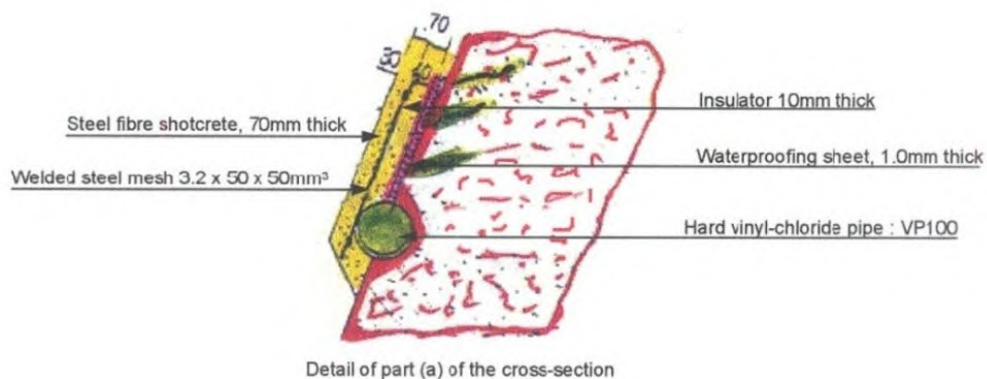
Collecting leakage water via a waterproofing sheet, a vinyl-chloride pipe, and covering with a protective layer of reinforced steel-mesh shotcrete (Russell, 2001).
